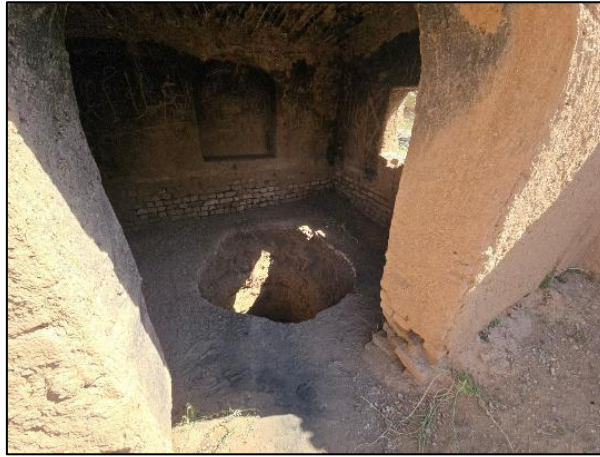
Interior of the eastern section and the well excavated at its center (photograph taken in 2024).
